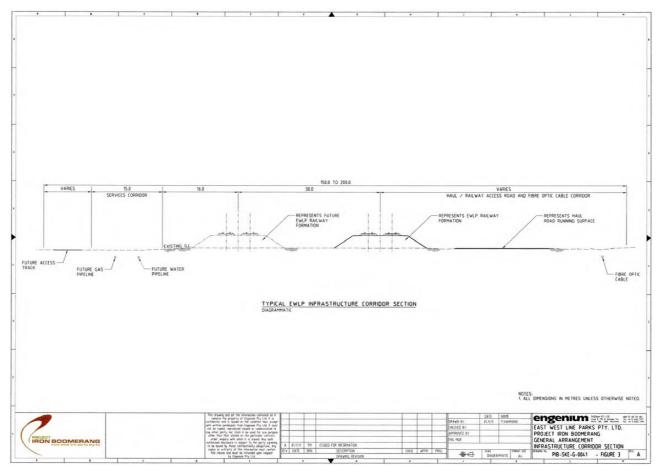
Typical EWLP / PIB Infrastructure Corridor Section
